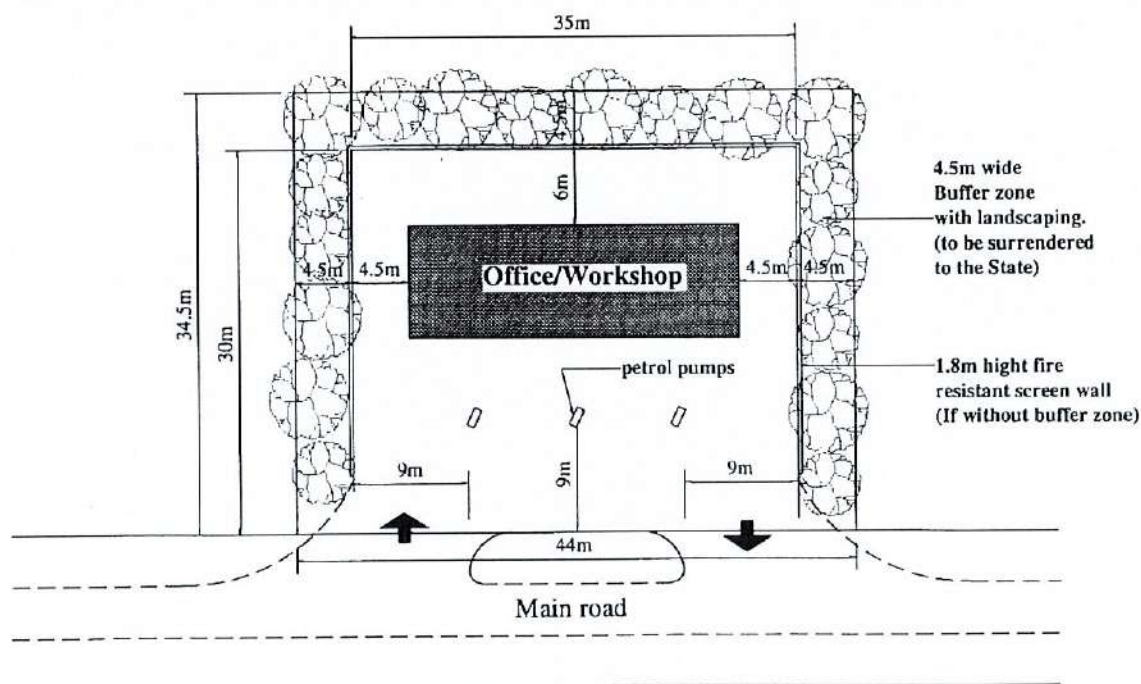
SETBACK REQUIREMENTS OF TYPICAL PETROL FILLING STATION
